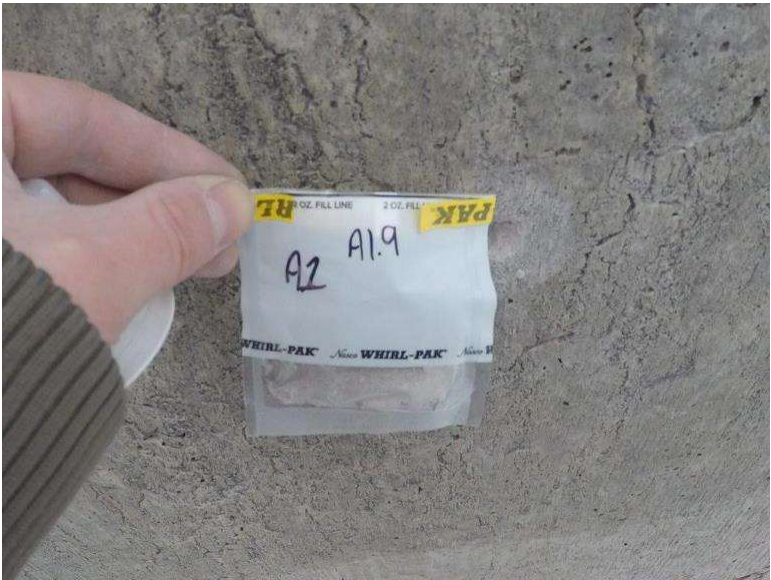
Site 1.8 Crandell Campground Kitchen Shelter 4
